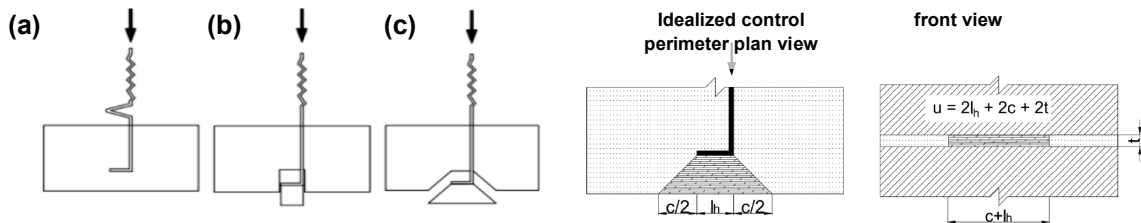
Possible compression failure modes of a) buckling failure, b) piercing failure c) punching failure from Arslan et al. (2021)
